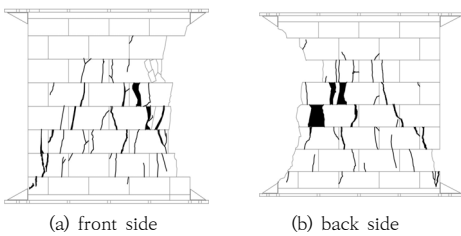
Wall crack pattern (L=1,600 mm)
